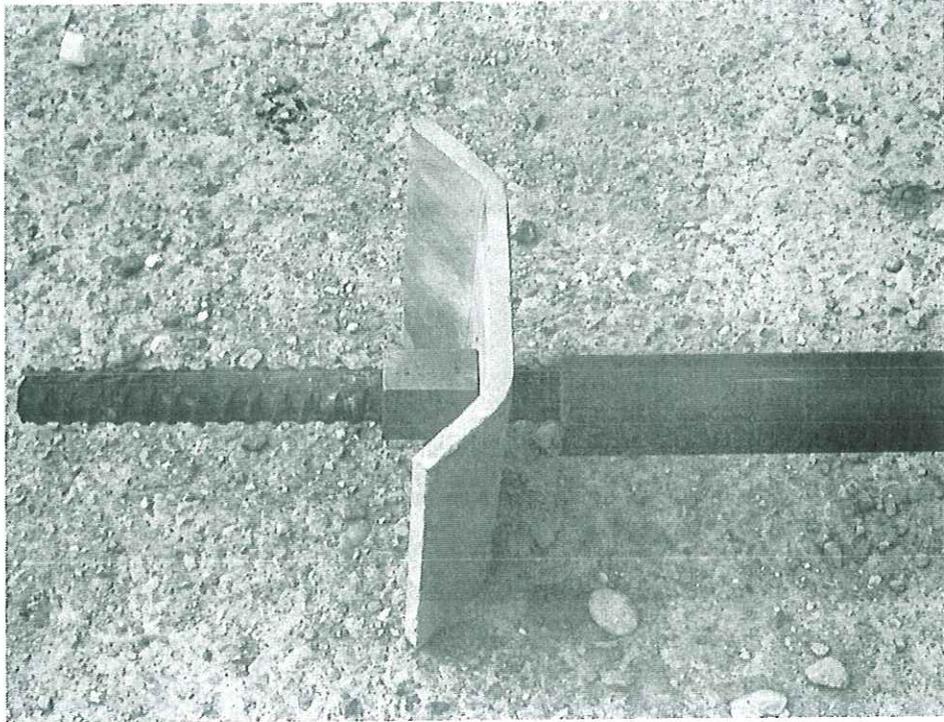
INDUSTRIAL ENTERPRISE FOUNDATION ANCHOR ASSEMBLY. (Photo Courtesy of Alain Lazard)
